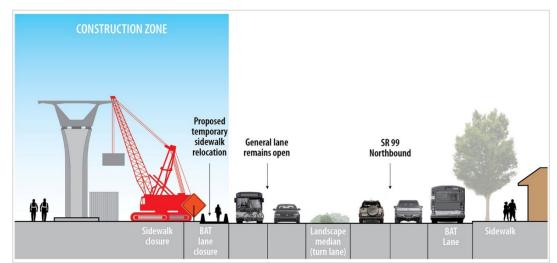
Construction of Elevated Guideway on Side of SR 99
